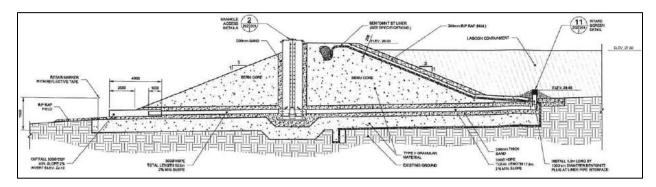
Discharge Pipe Section (Extracted from Construction Drawing No: 201)
